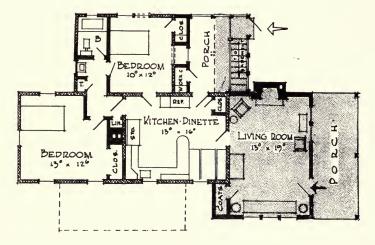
Typical floor plan of small low-cost house, with shaded portion to show addition made in remodeling.
